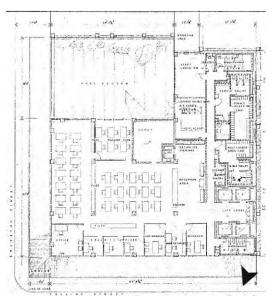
First floor plan showing the bank offices and rooftop garden. Drawings by Stephenson & Turner, dated August 1962 (BAP).
